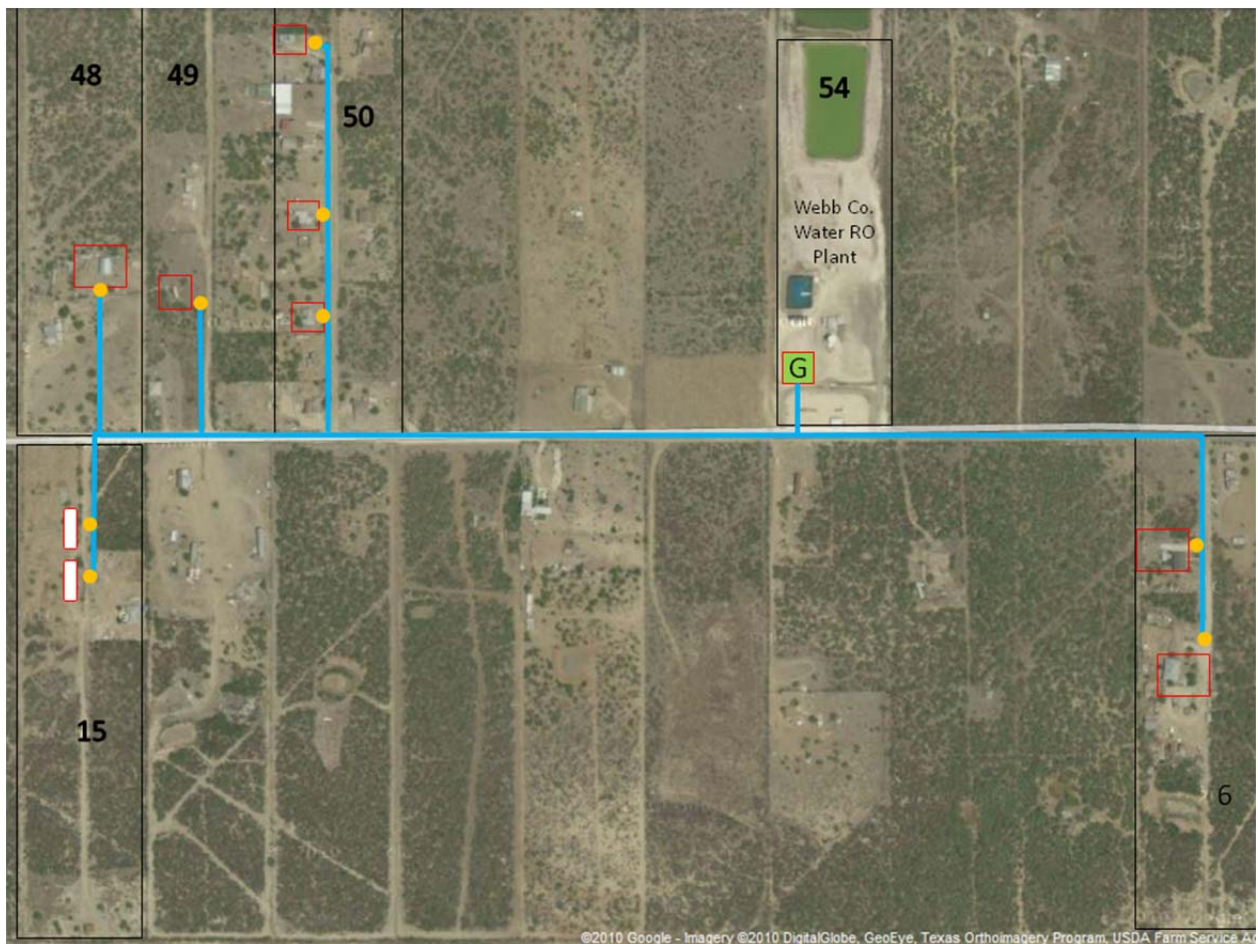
Aerial View of Las Lomas Proposed Site Layout
